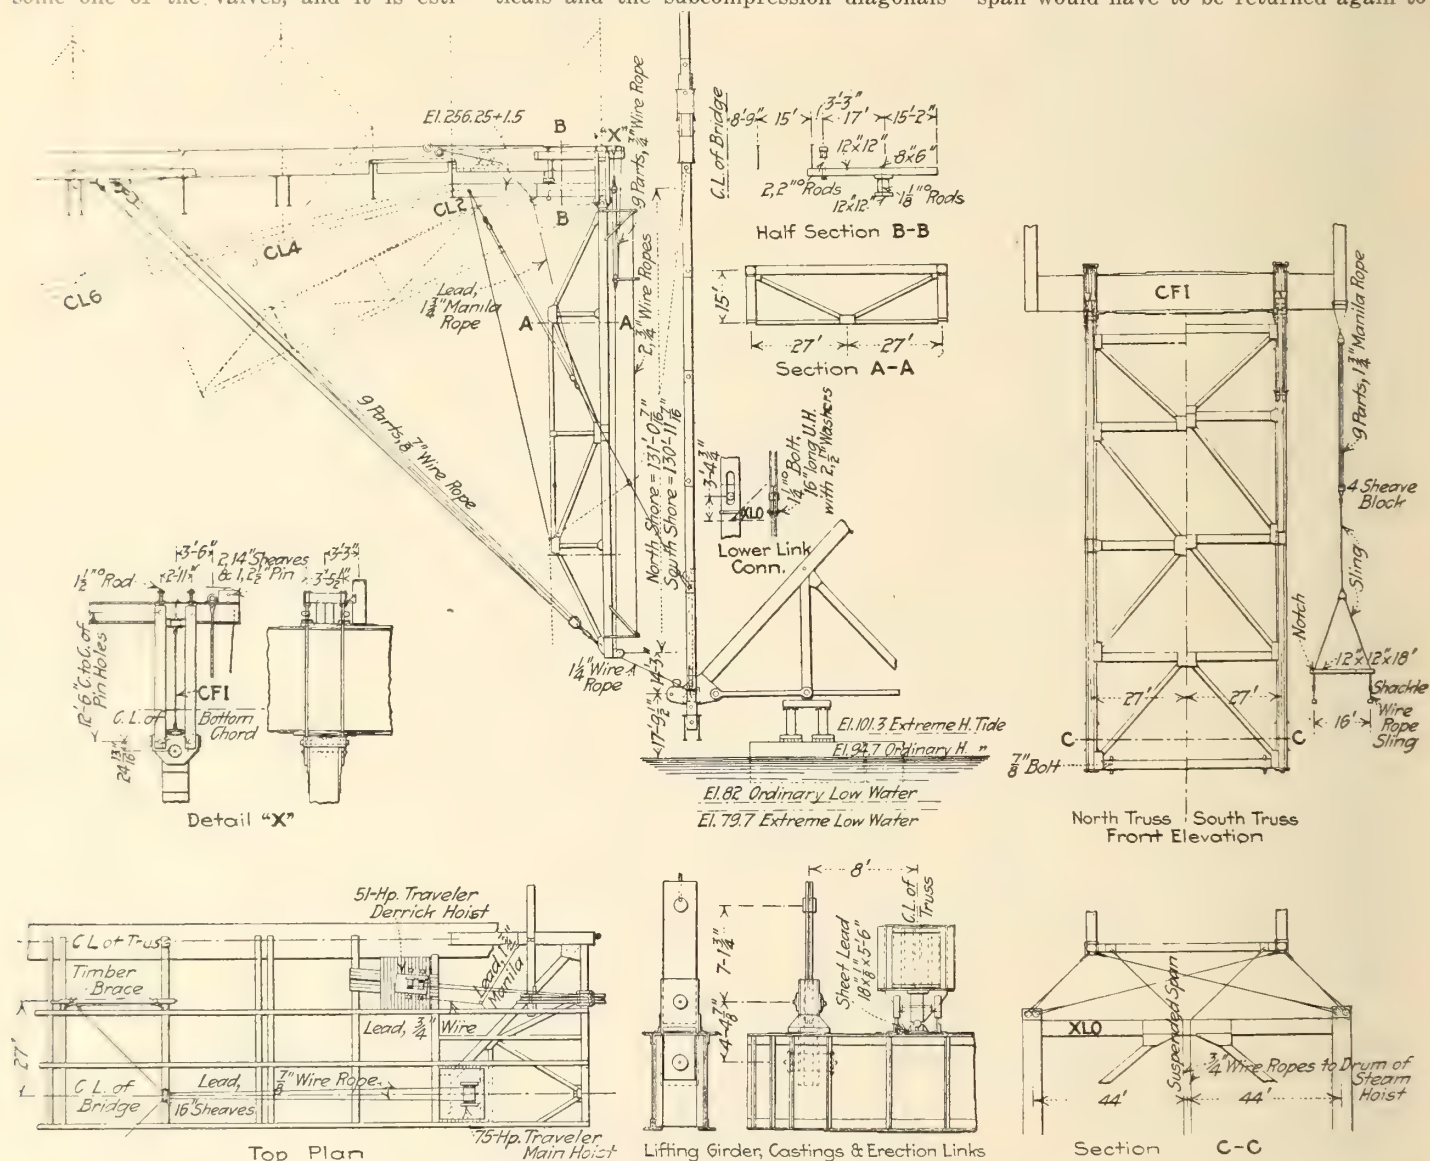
Detail of arrangements for mooring and hoisting suspended span, Quebec Bridge.
